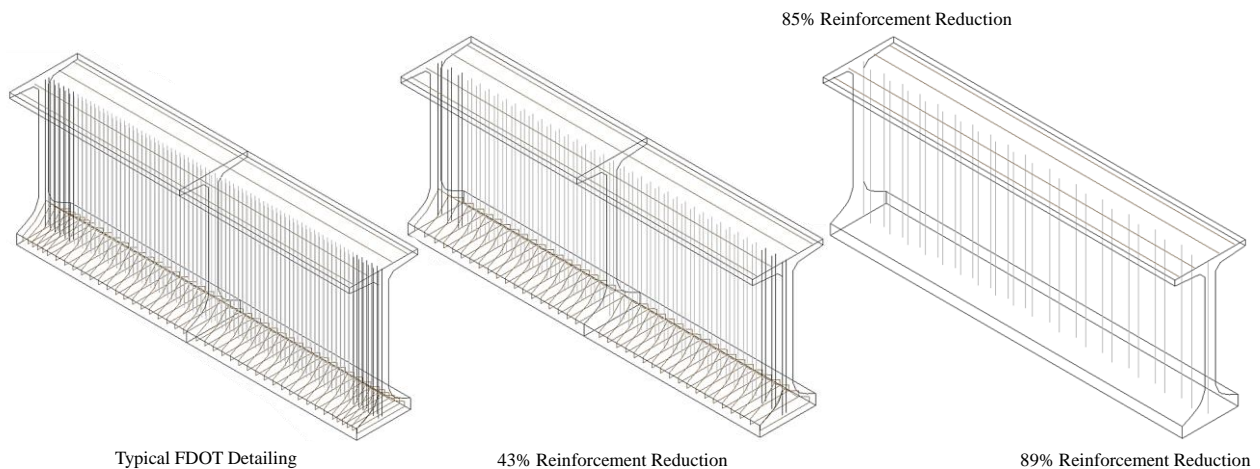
Overview of FIB 96 mild-steel reinforcement
